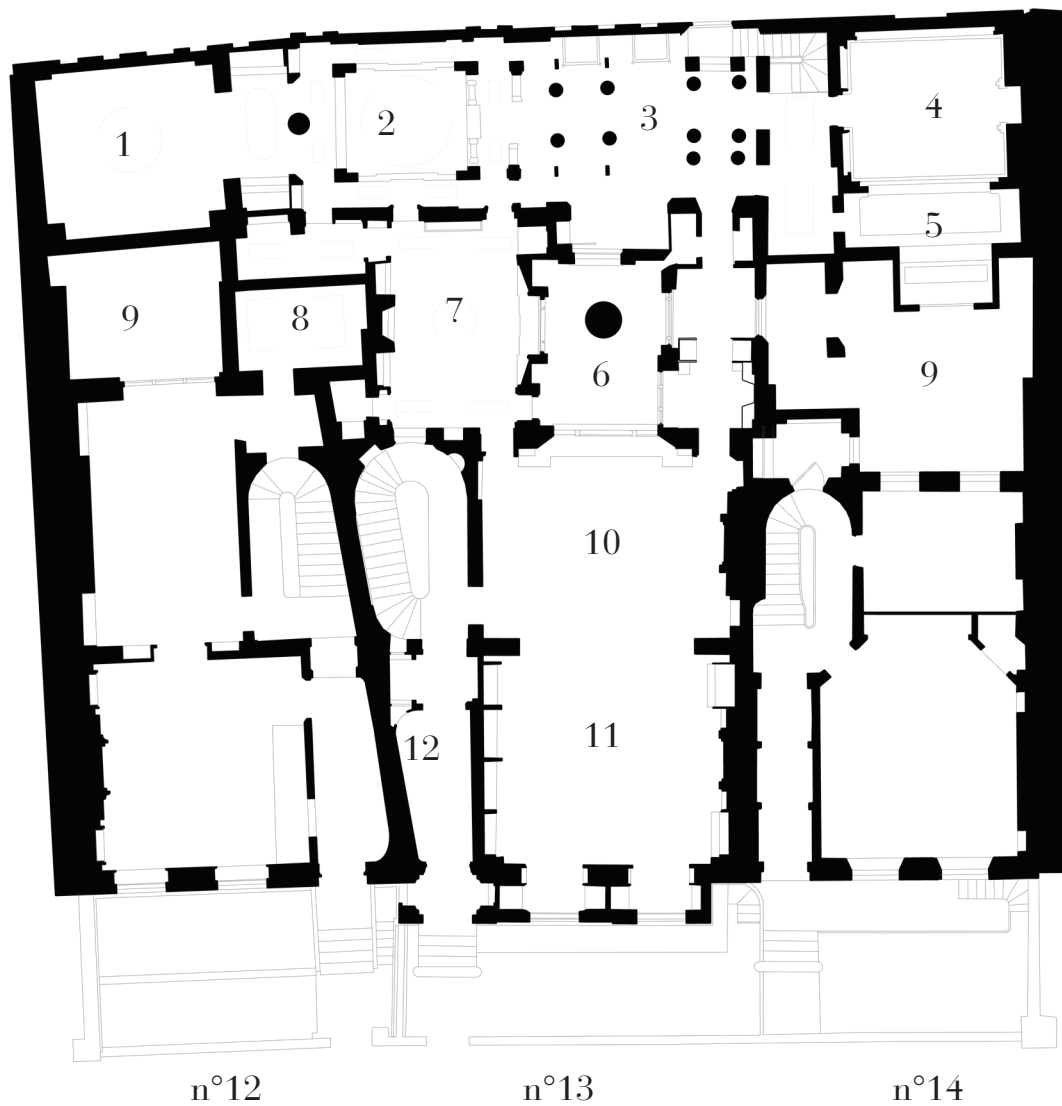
Ground Floor Plan Sir John Soane's Museum, scale 1:200
